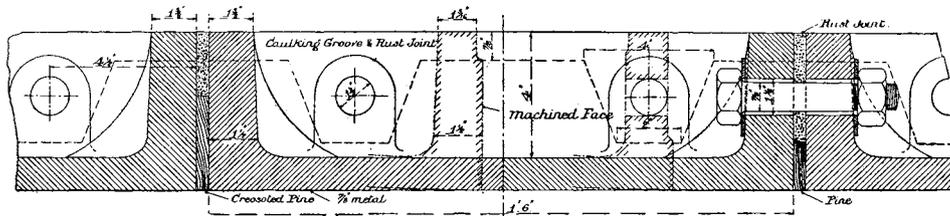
BAKER STREET AND WATERLOO RAILWAY, LONDON.
